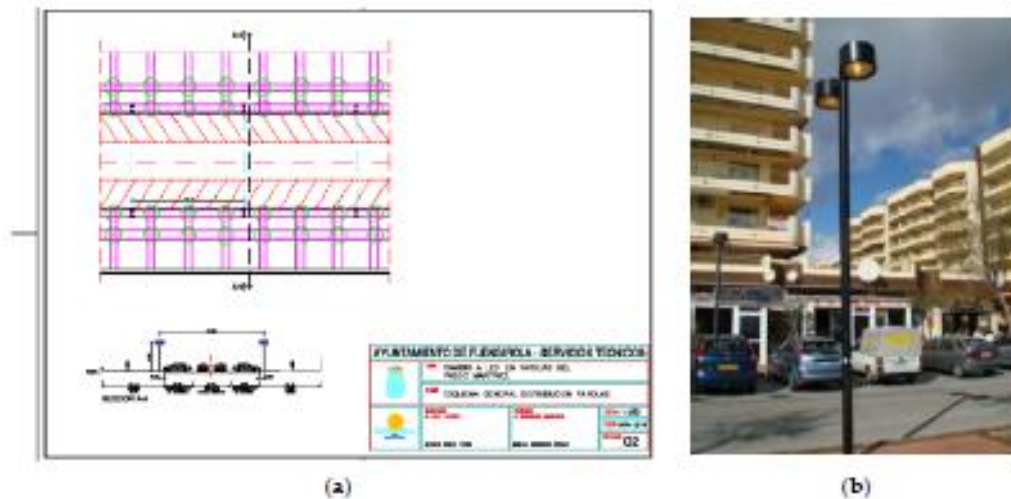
Luminaire detail and their position on a plane. (a) Detail plan of luminaire arrangement in the street; (b) Luminaire detail. (Source: own elaboration).
